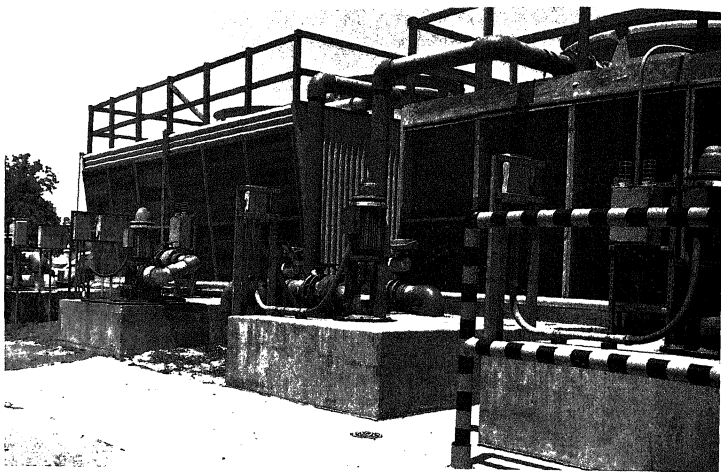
Built-up towers with submersible pumps and concrete sumps.
